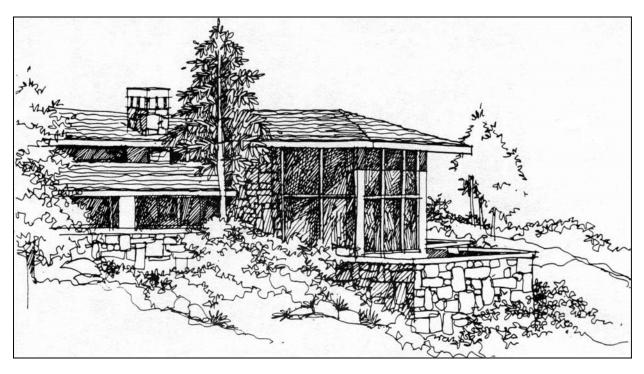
An outdoor living area used to extend the form of the building to relate to the slope of the topography.
